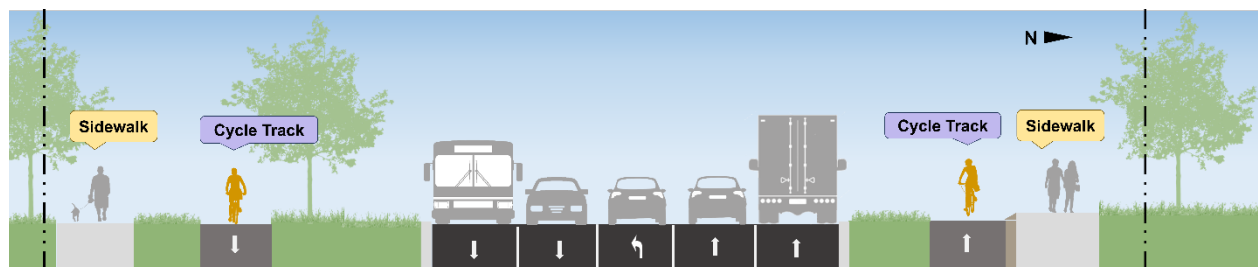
Albion Avenue Proposed Cross-Section - 110 Metres East and West of Kipling Avenue
